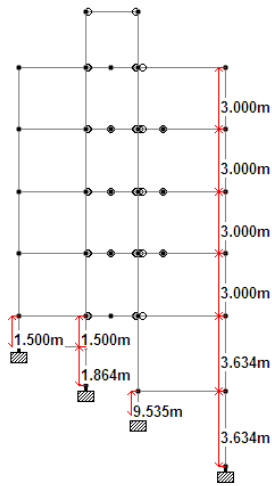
Elevation of residential building on 30 deg. Slope
